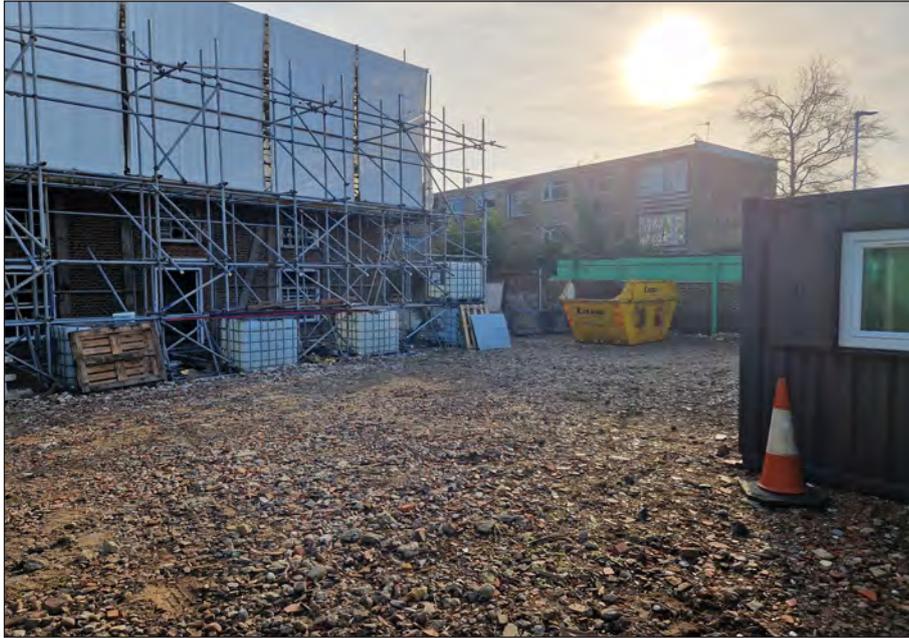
View of the western section of the Site including the front elevation of Grade II listed The Dower House (list entry 1080196), facing southeast
